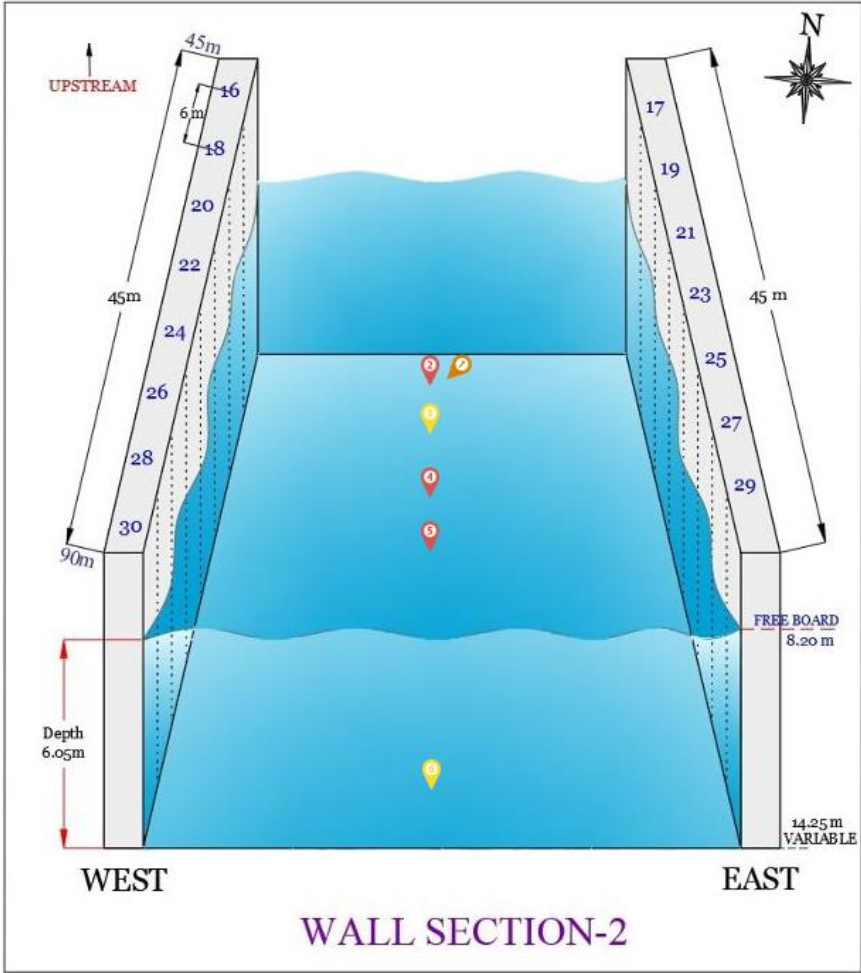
Heat map and Observations at Wall Bottom Section 16 - 30
